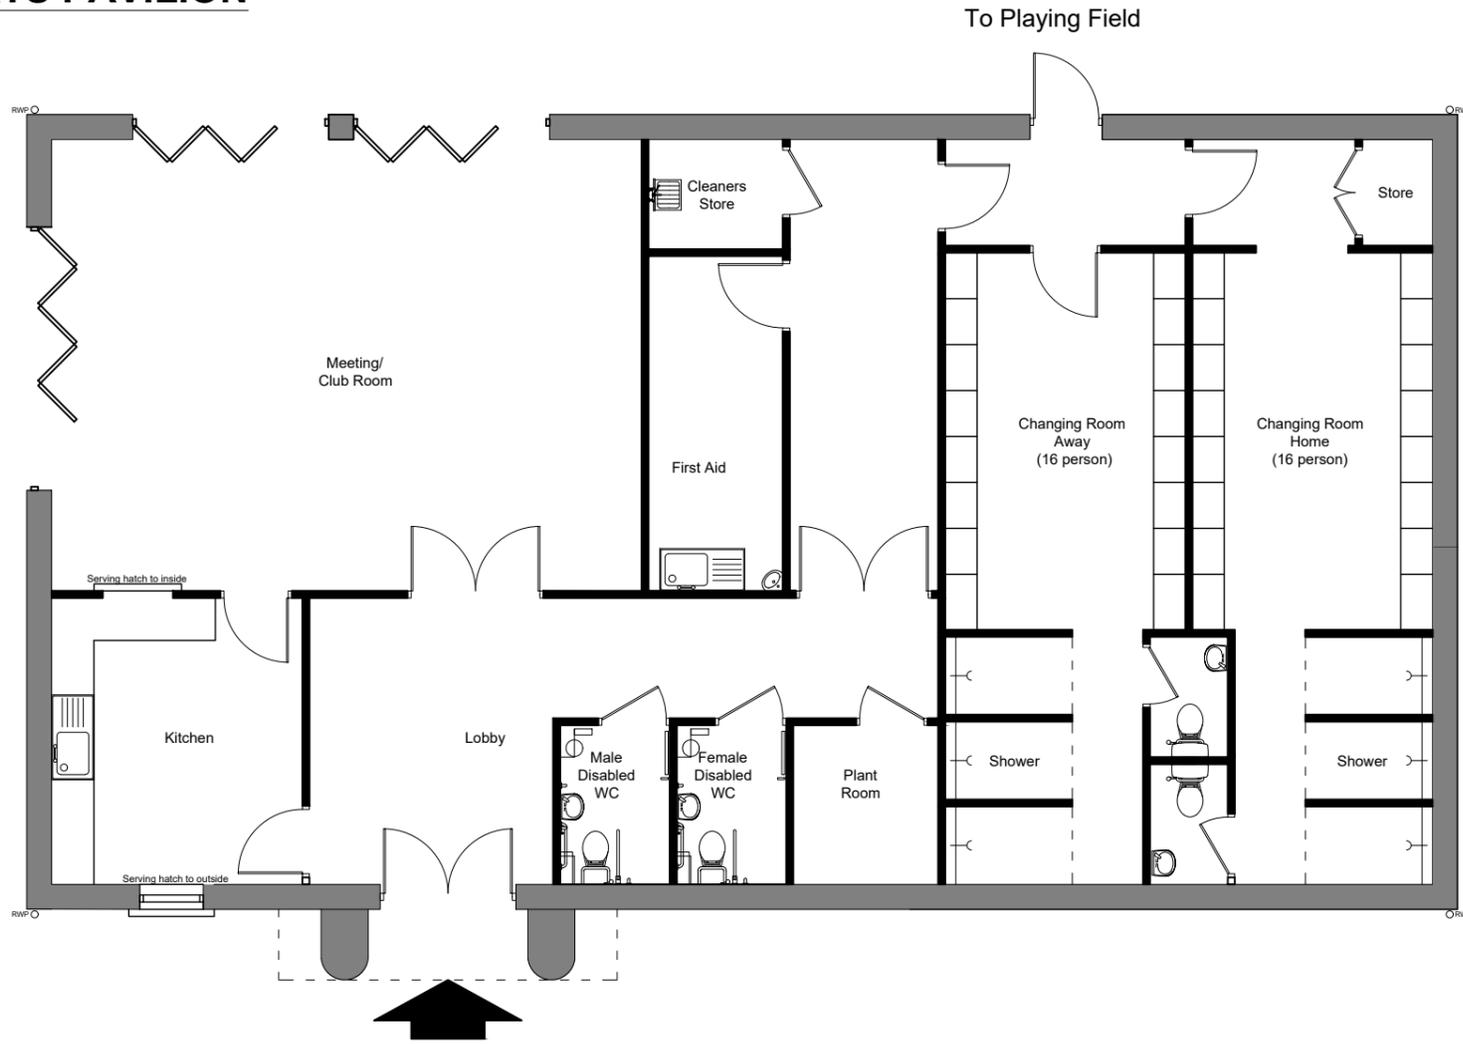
Example of Sports Pavilion with Solar Panels in Braunstone
